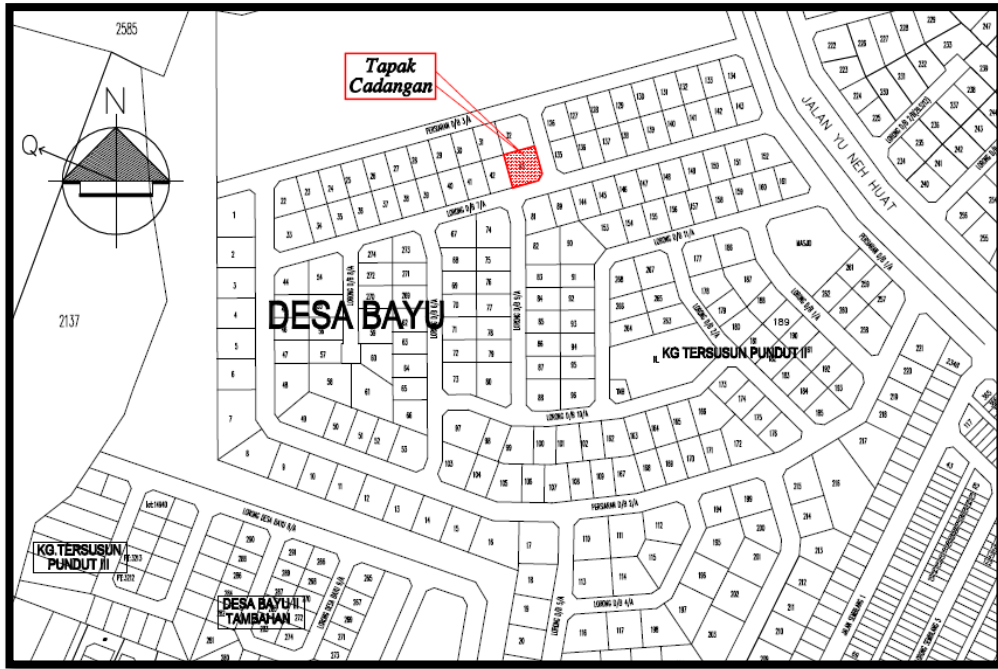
Location Plan (Scale: 8 chain to an inch).
